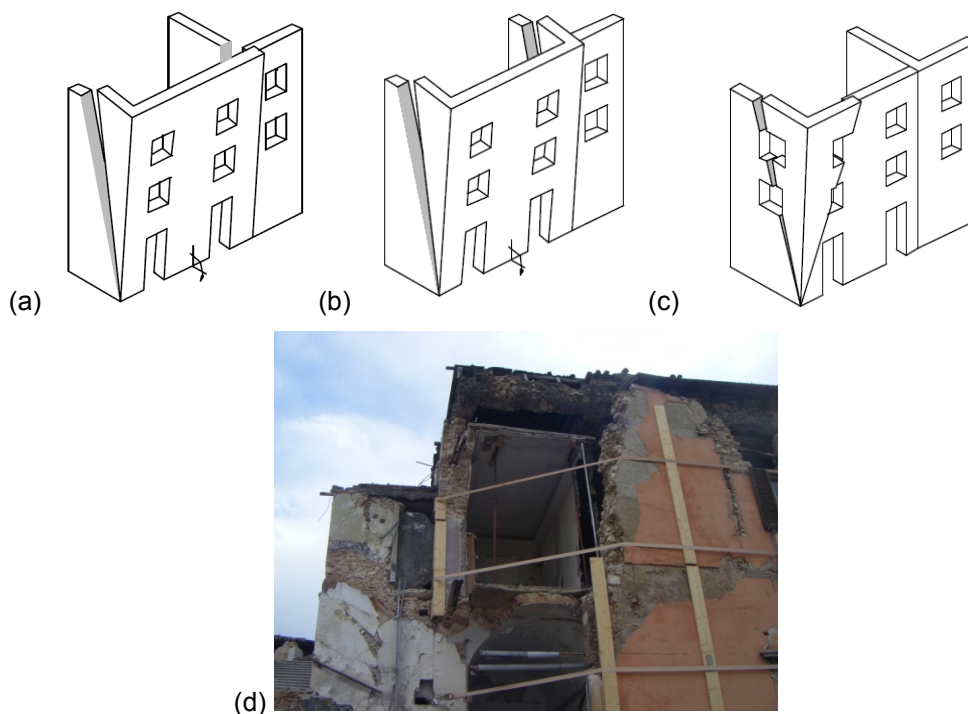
Complex overturning mechanisms: (a) overturning with one side of a orthogonal wall, (b) overturning with both sides of orthogonal walls, (c) corner failure and (d) corner failure of a building in L'Aquila.
